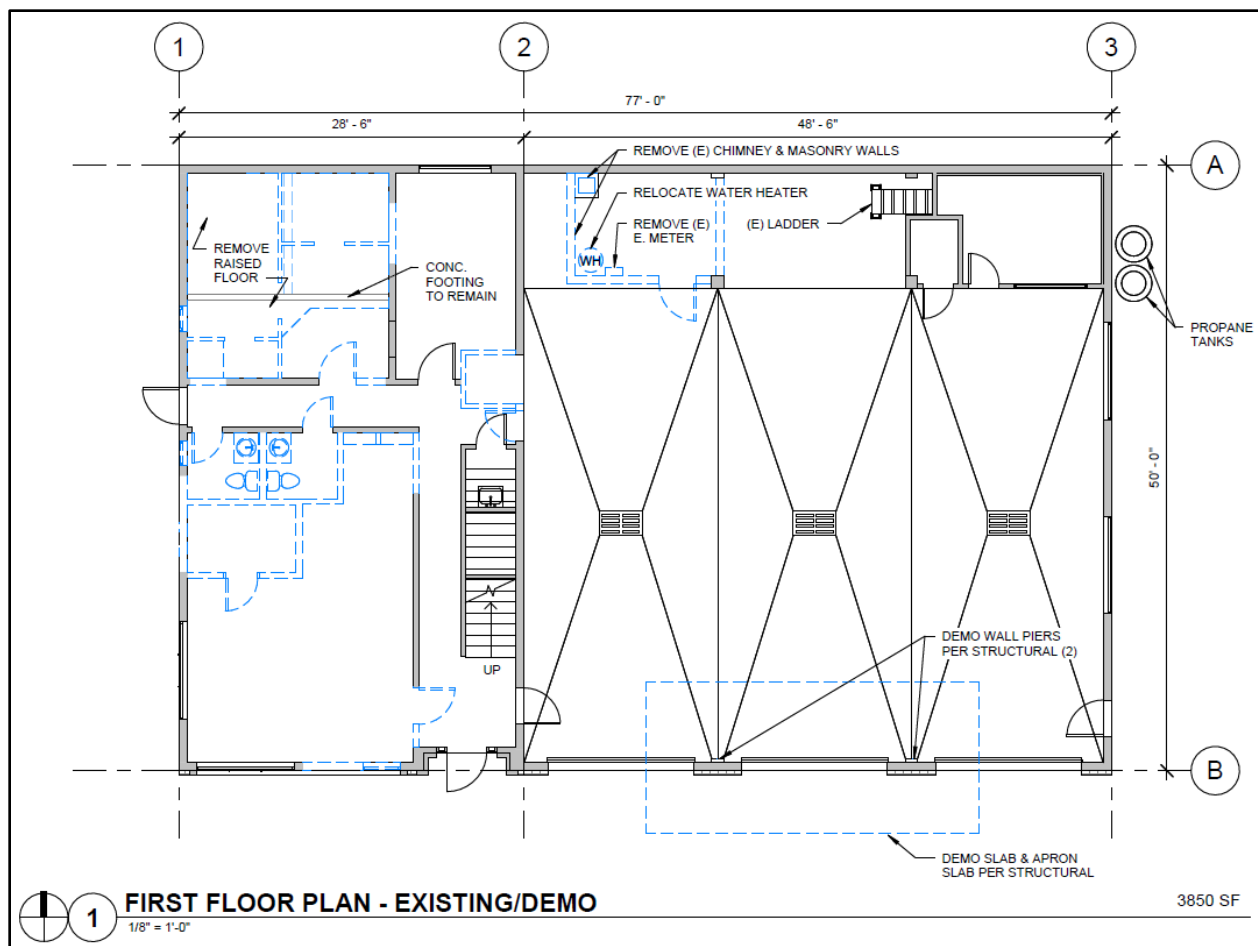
Structural drawing sheet B-2 (base plan referenced above).
